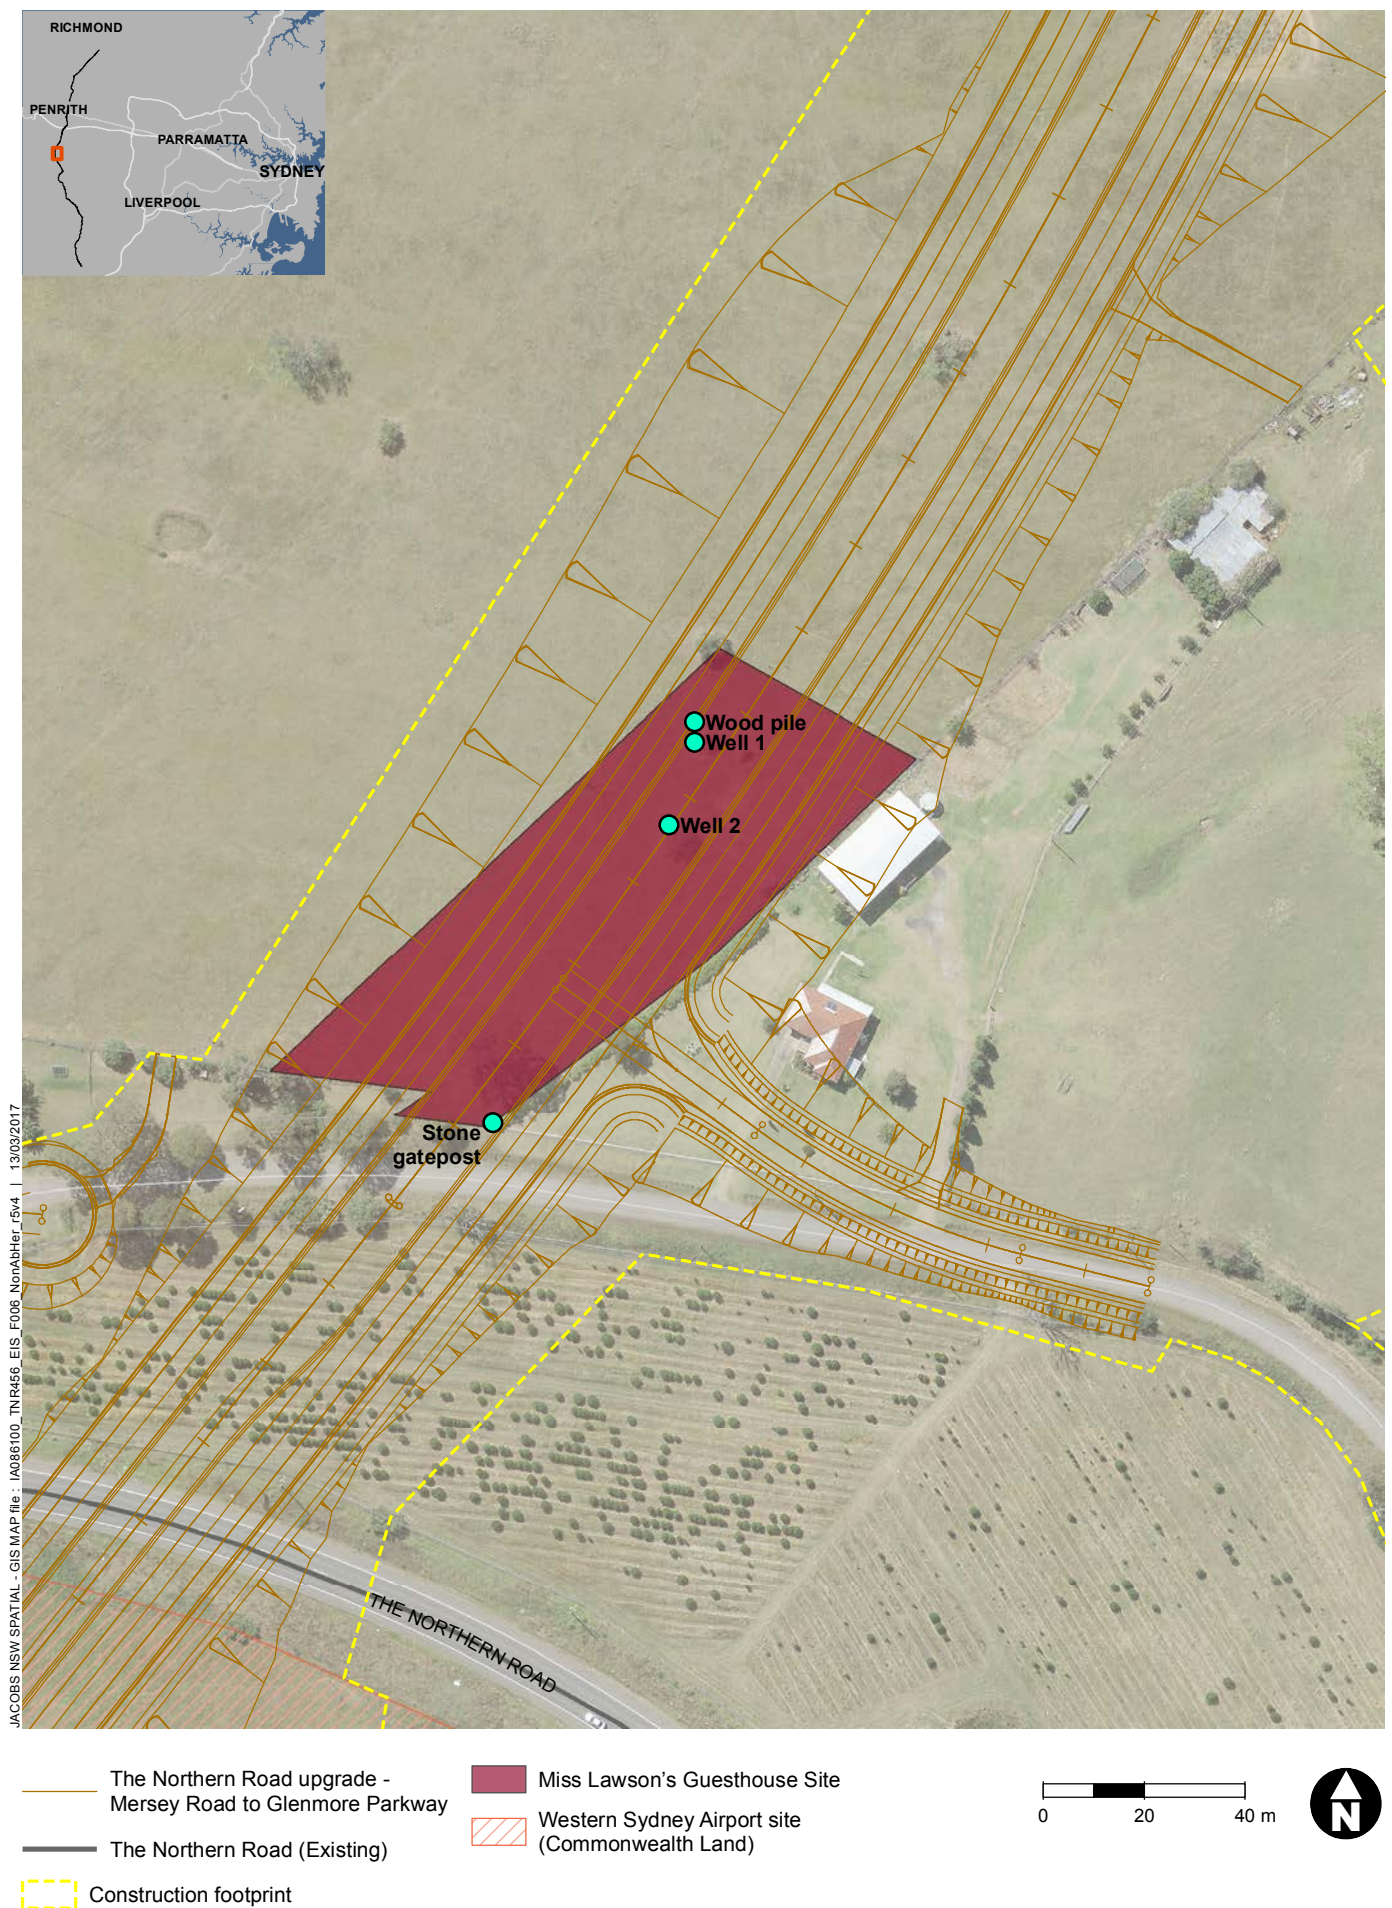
| Location of Miss Lawson's Guesthouse Site (Item 9) in relation to proposed works
